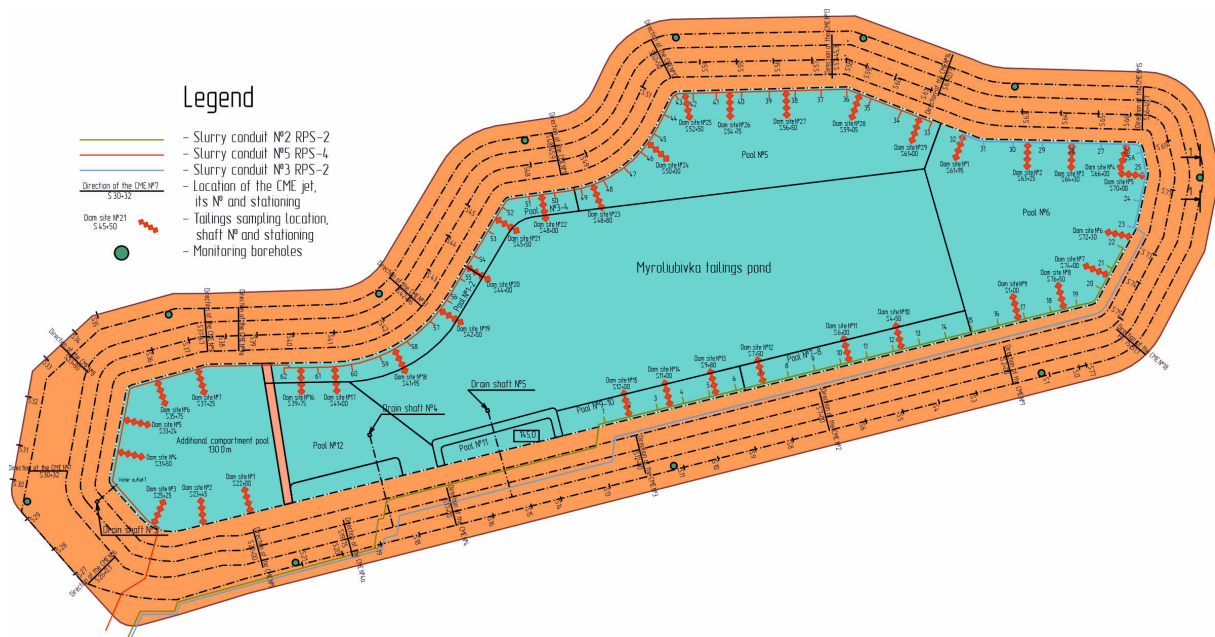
Tailings sampling plan for Myroliubivka tailings storage facility.
